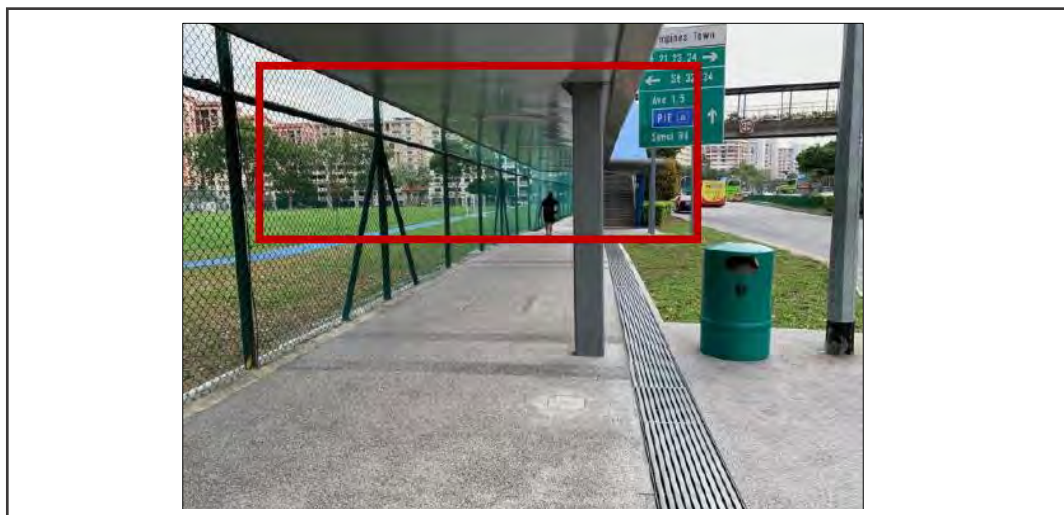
Cladded Roof of Covered Linkway Shelter are Not Recommended
